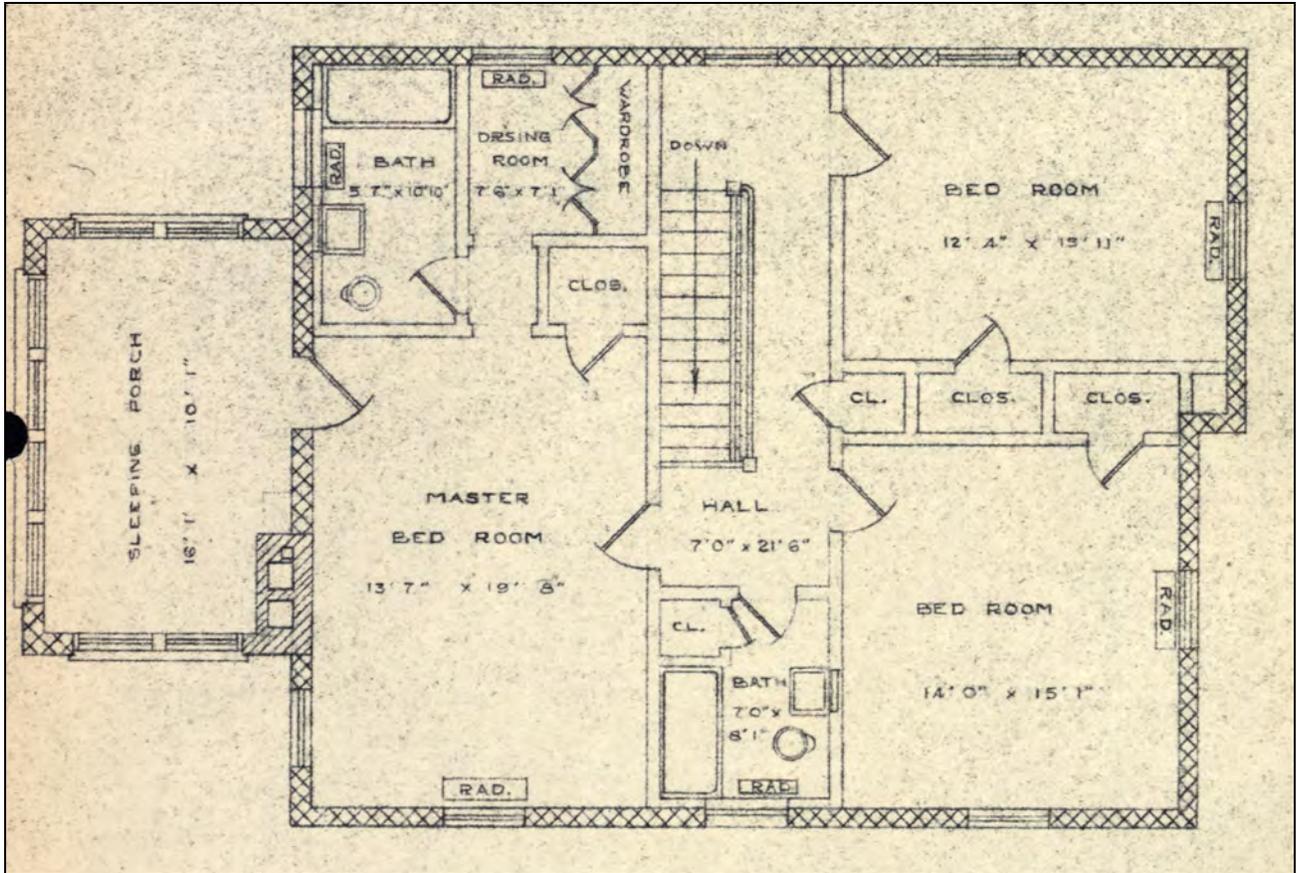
Typical second floor plan for company officer quarters (Source: Fort Sill Digital Archive 5000A_B5083_BB07_B51_P2158).
